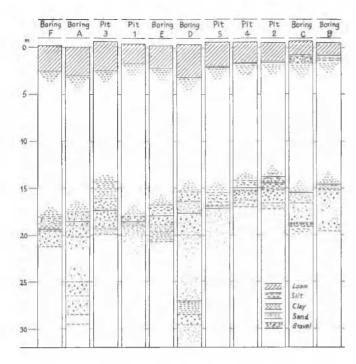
The Soil Profile of the Site Coupe du sous-sol
